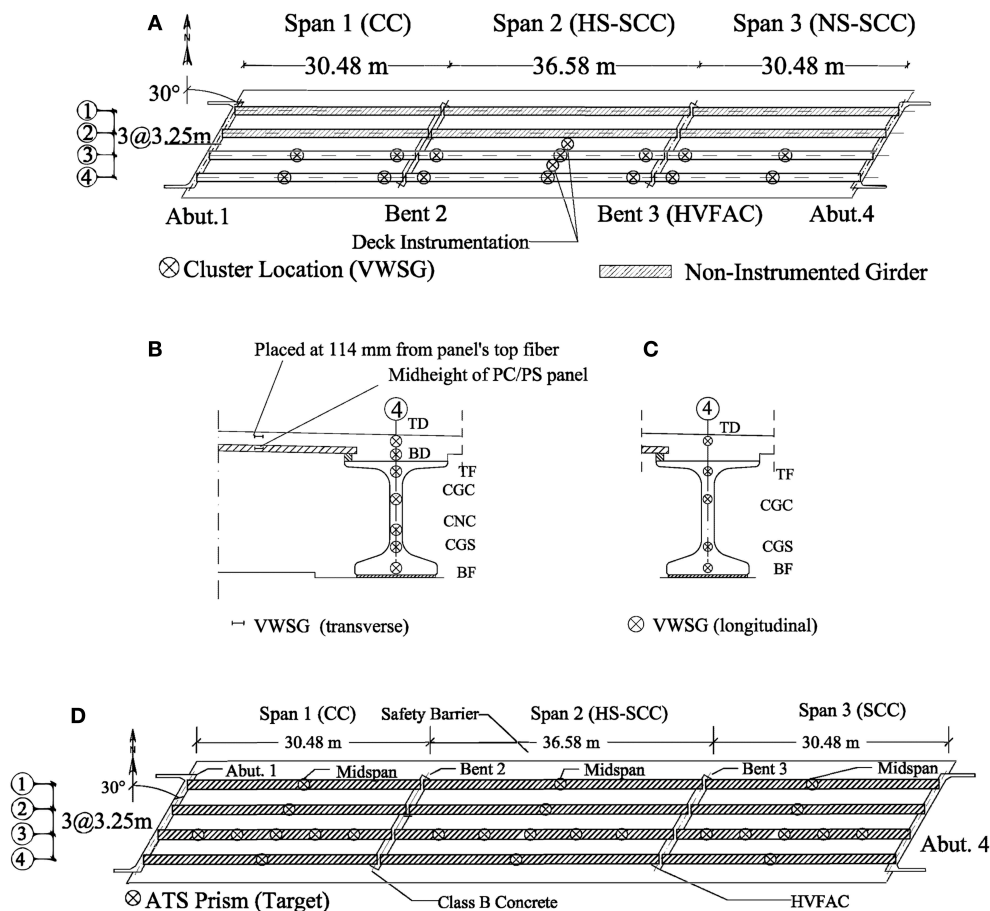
| Bridge instrumentation details. (A) VWSG installation layout; (B) midspan cluster location; (C) near-end cluster location; (D) prism layout.
